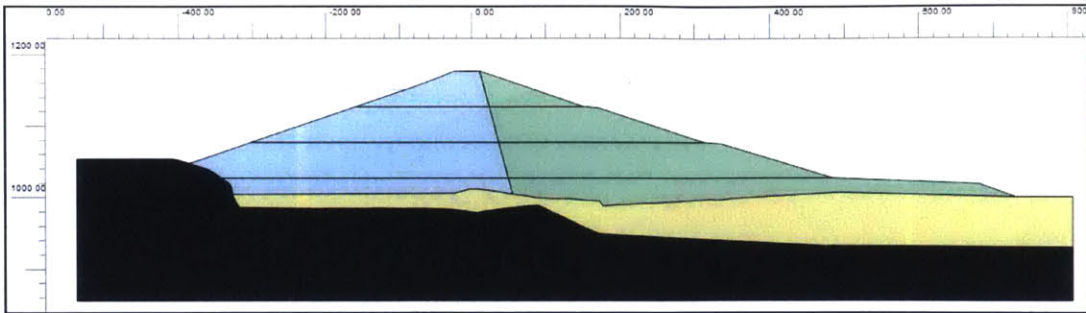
FE model showing staged construction embankment layers and foundation soils.
